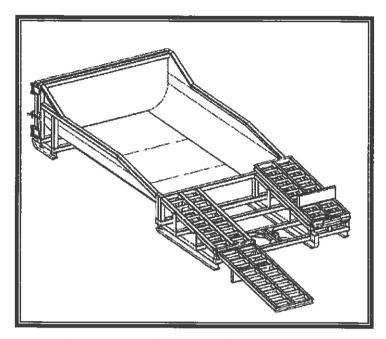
Prefabricated Concrete Washout Container with Ramp
